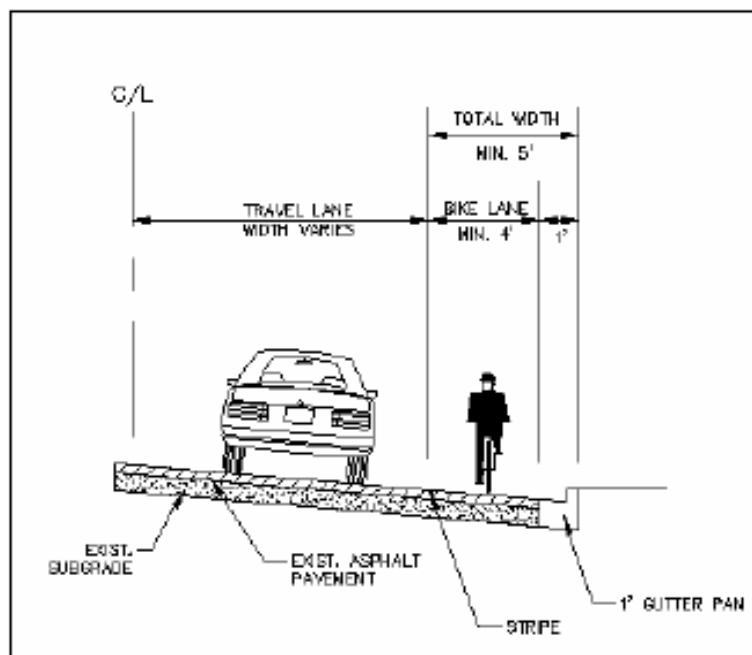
Typical Bike Lane Detail (road with gutter pan)
